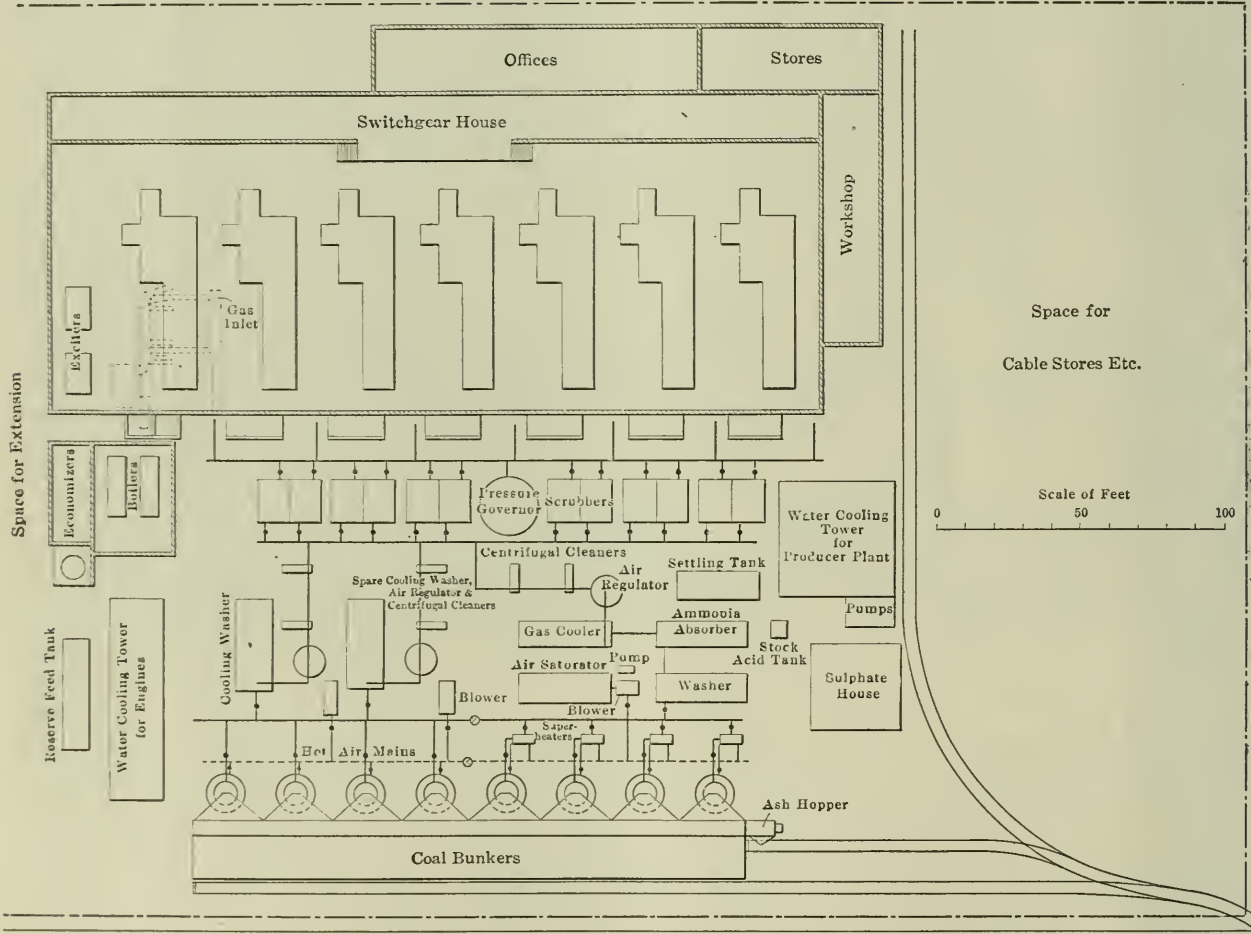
PLAN OF 10,000-KILOWATT GAS PLANT
